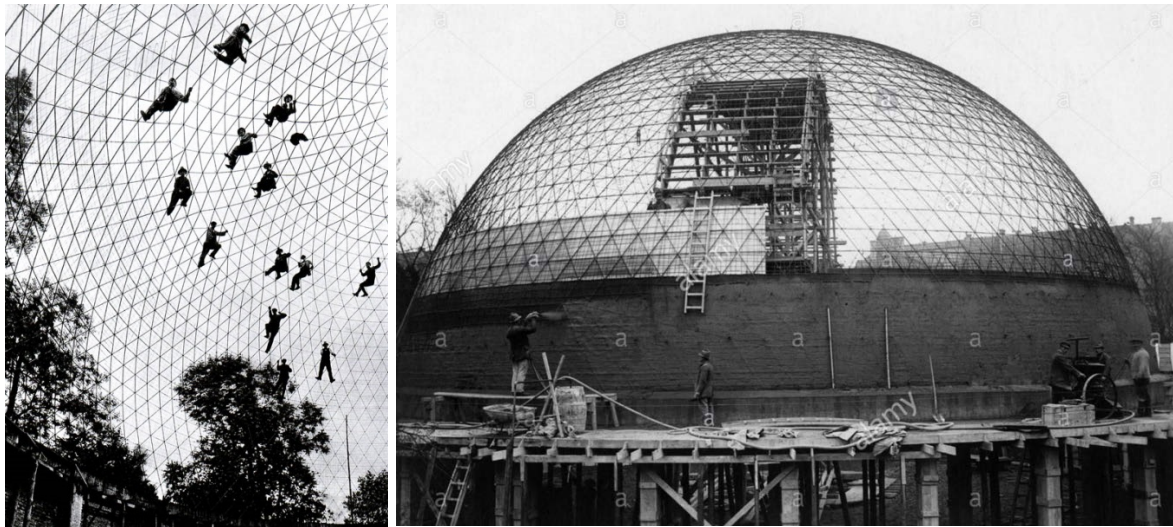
Walter Bauersfeld, Dyckerhoff & Widmann. Planetarium, Jena, Germany, 1924-1925.
